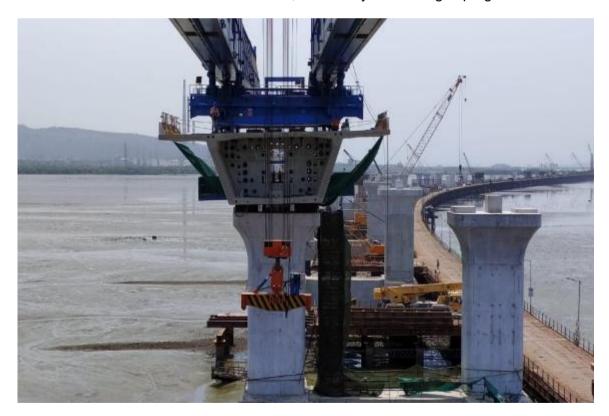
MP 15-16 Pier Head Erection Intertidal Section In Progress
